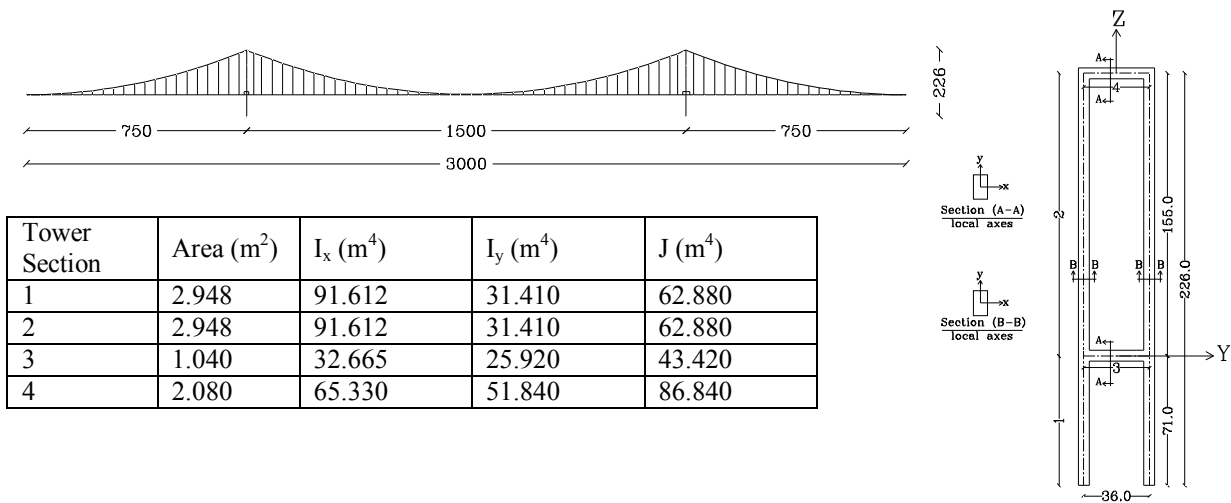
Three Spans Suspension Bridge Layout - Central Span 1500m
